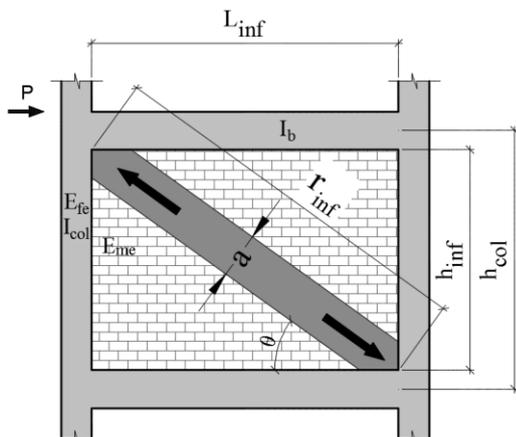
Equivalent diagonal strut for modelling of infill wall
